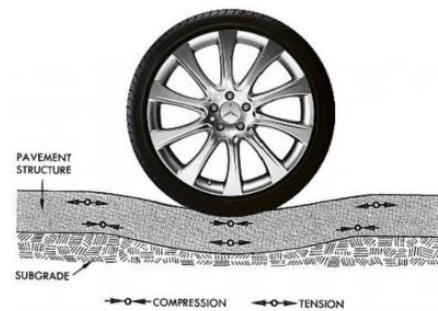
Pavement deflection in tensile and compressive stress in a pavement structure [31].
